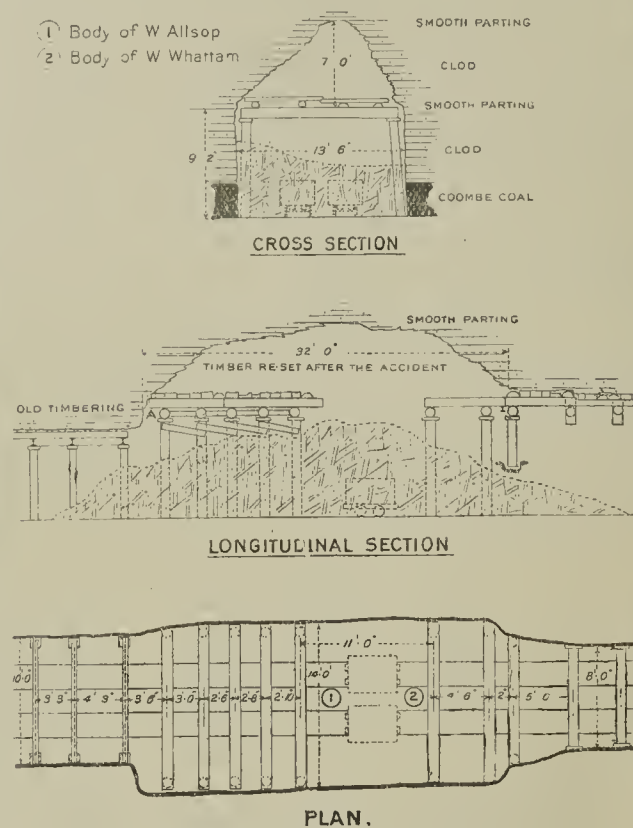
SKETCHES ILLUSTRATING FALL OF ROOF AT SHERWOOD COLLIERY.
